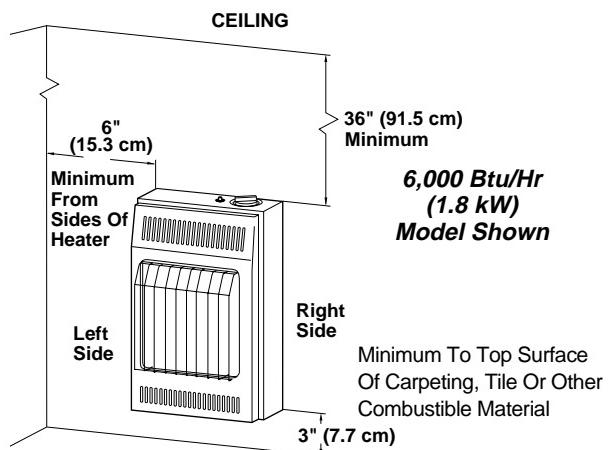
Mounting Clearances As Viewed From Front of Heater
